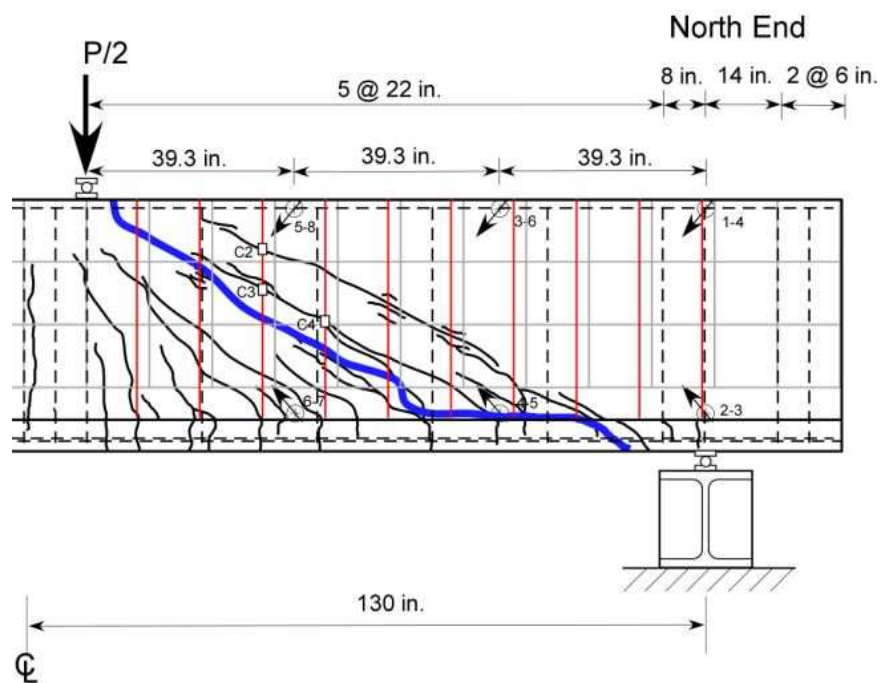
Specimen IT.5.22.12.S crack map (failure test)
